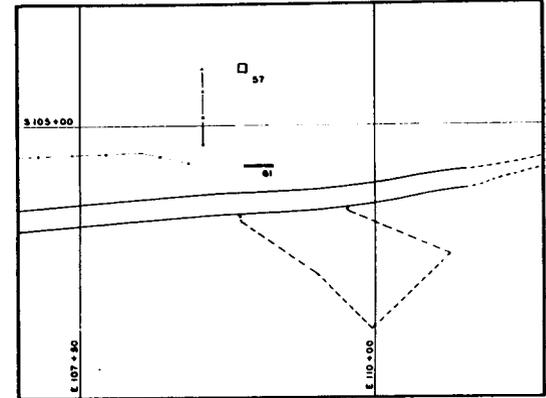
I: Structure Location Plan for TA-49 - Frijoles Mesa Site (1983 Drawing from the LANL Technical Area Structure Location Plans)
